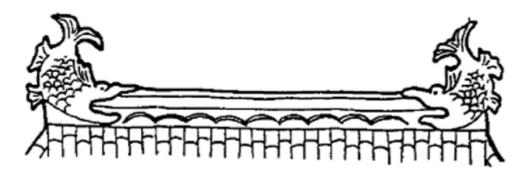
Ridge of fish-decoration on the roof Buddhist bell of tower in Zhongshan
